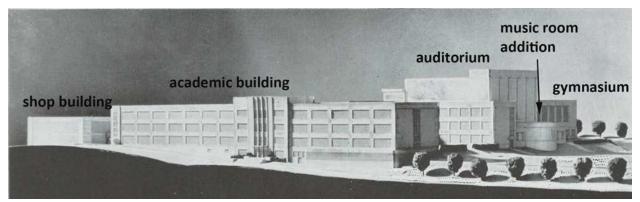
Model of George Washington High School showing the music room addition as it was originally designed. Source: The Architect and Engineer (April 1936)
